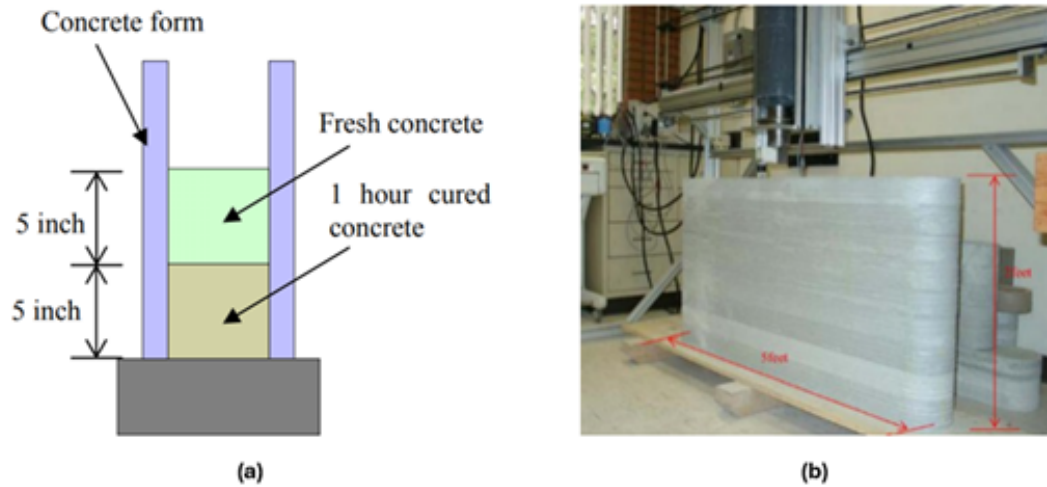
Contour Crafting applied to concrete wall fabrication (a) Form and fill scheme. (b) Concrete wall and form [27].
